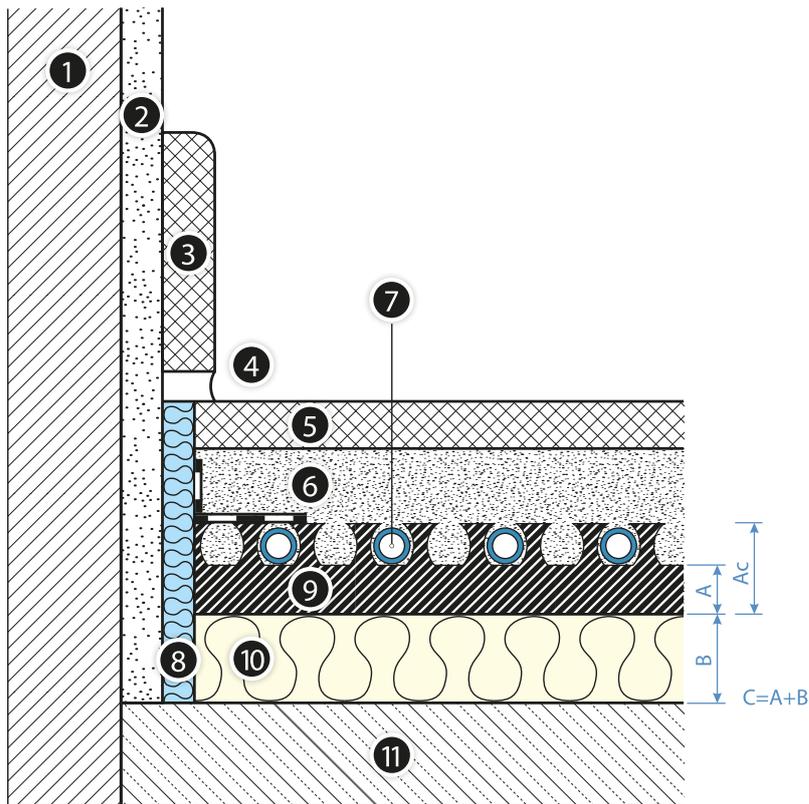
Floor heater with KAN-therm Profil3 System board and supplementary insulation on the ceiling above the internal not heated room and on the ceiling laid out on the ground (damp insulation required!)
